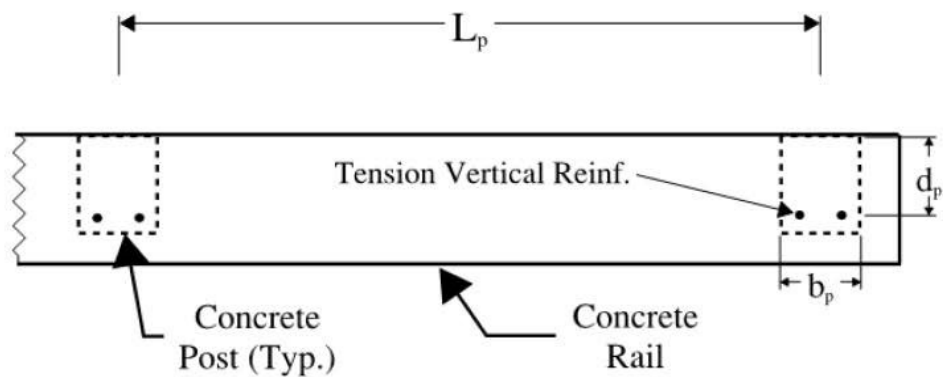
Plan View of a Concrete Post-and-Beam Railing showing Concrete Post Inputs
